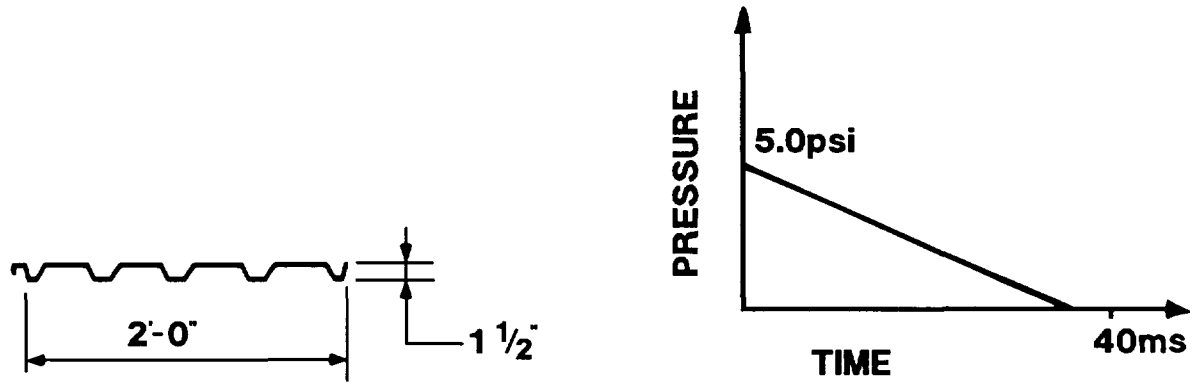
A-3 Roof decking configuration and loading, Example 5A-3
